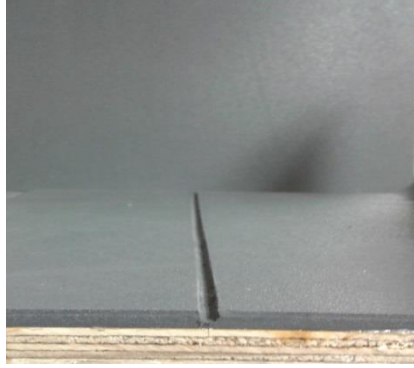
Grooved Protect-All Rapid Weld Seam
